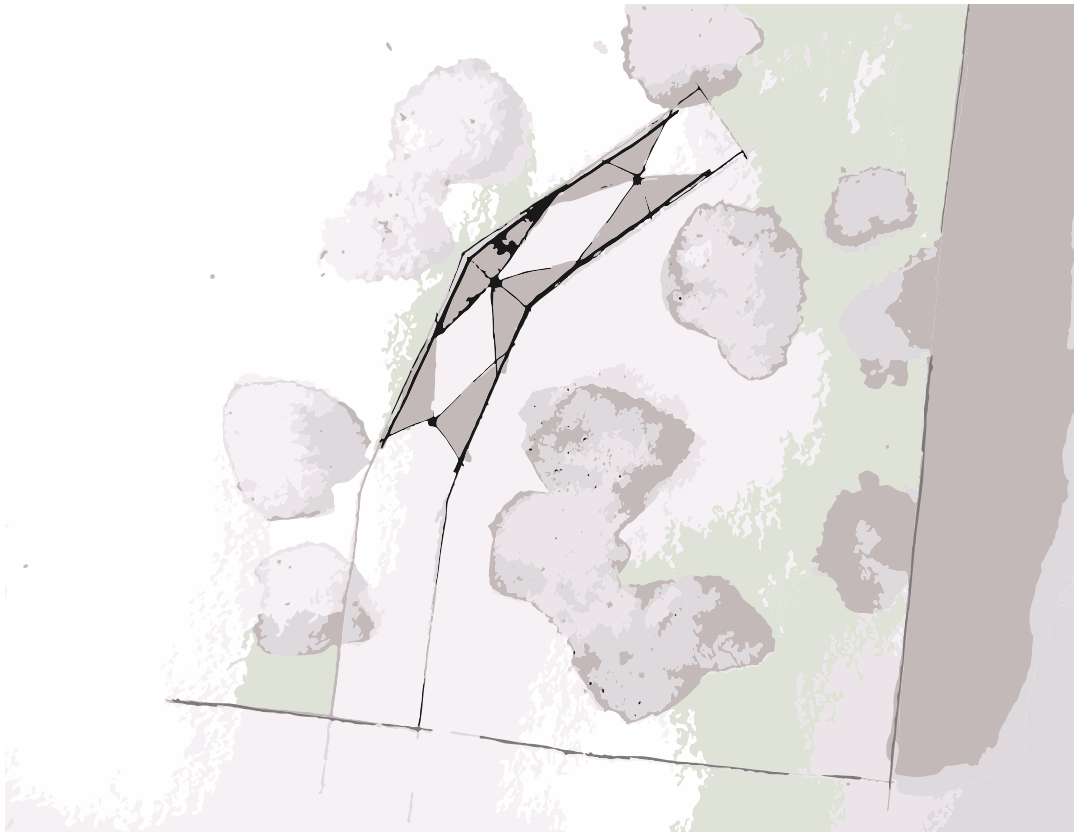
VATICAN CHAPEL PLAN (AUTHOR,2023)
